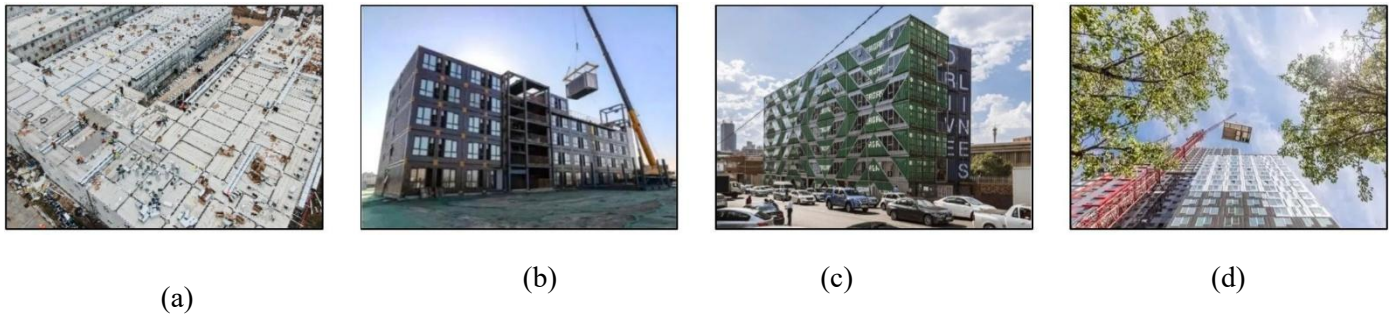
Engineering applications of modular buildings [21]: (a) Houshenshan hospital, Wuhan; (b) Jinghai ziya white collar apartment, Tianjin; (c) Drivelines studios residential building, South Africa; (d) Brooklyn B2 residential building New York
